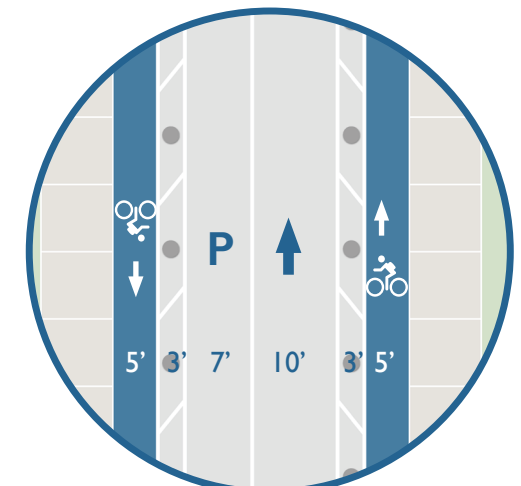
Street Layouts for a Common Somerville Street Width of 26 Feet
